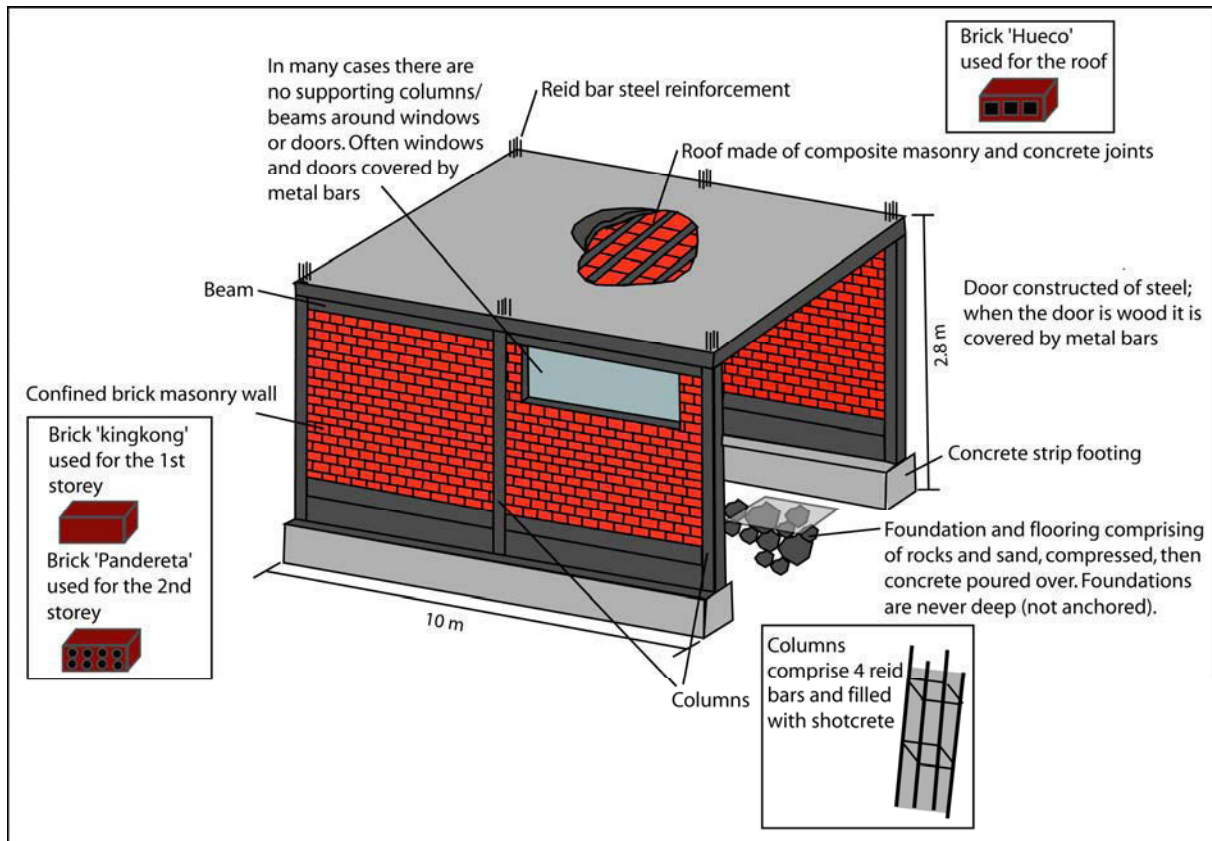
Typical structure of a confined masonry building as observed in Arequipa. Three different types of bricks are used in construction with subsequent storeys constructed using pandereta (modified from Loaiza and Blondet, 2003a).
